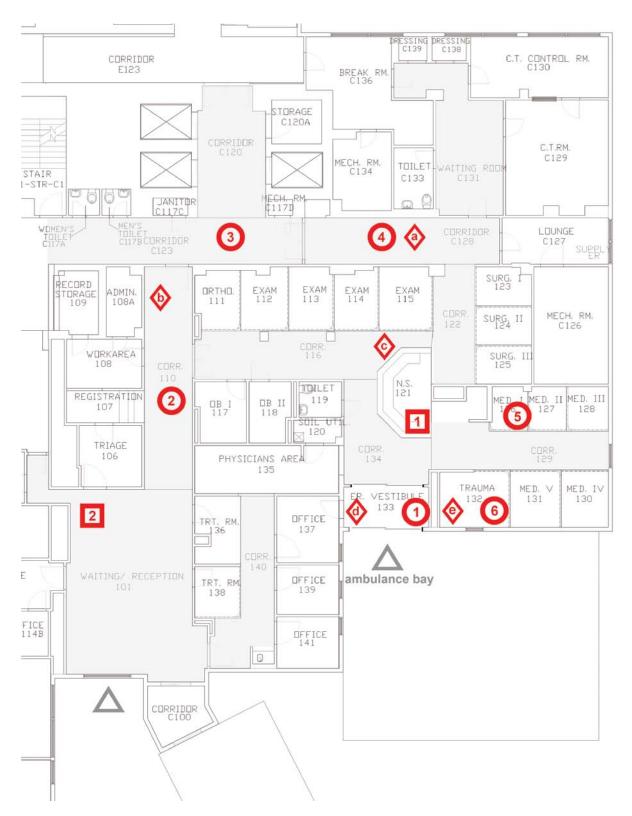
Floor Plan and Measurement Locations for Hospital 5
